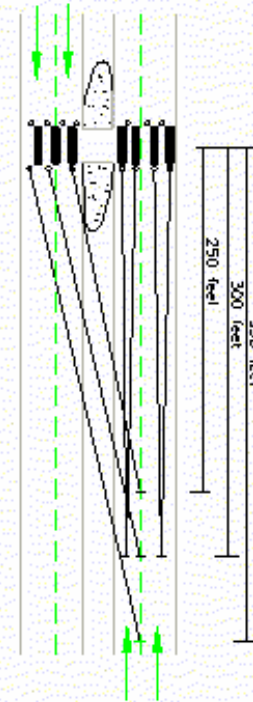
SCHEMATIC OF TYPICAL KIRKLAND FLASHING CROSSWALK
